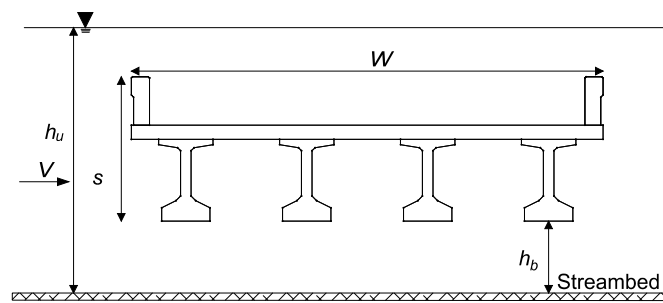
Schematic of a bridge superstructure and definition of flow and bridge geometry parameters
